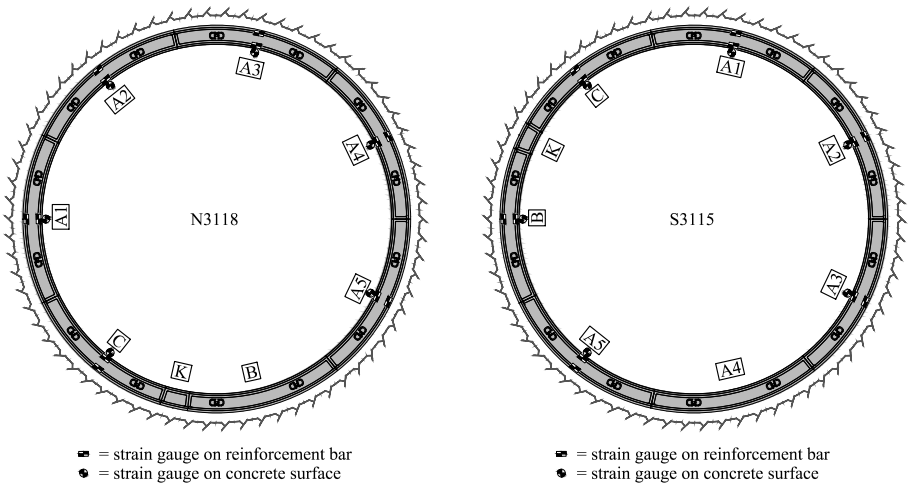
Segment orientation in tunnel sections N3118 and S3115.
